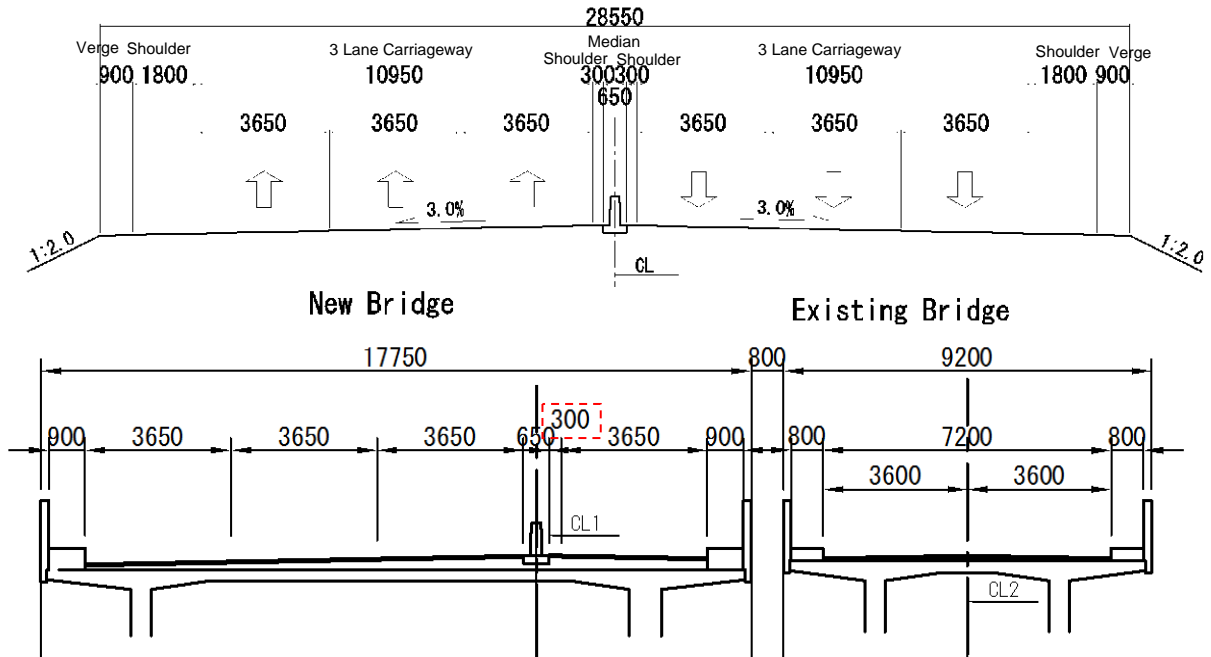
Typical Cross Section for Meghna Bridge
